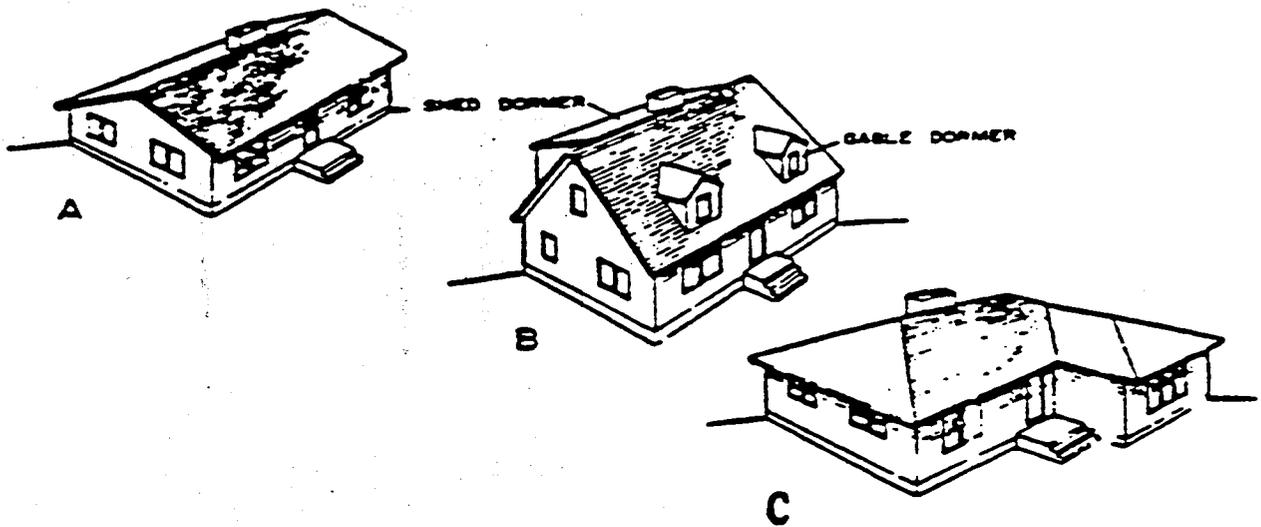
A, Gable roof; B, Gable with dormer; C, Hip roof.
